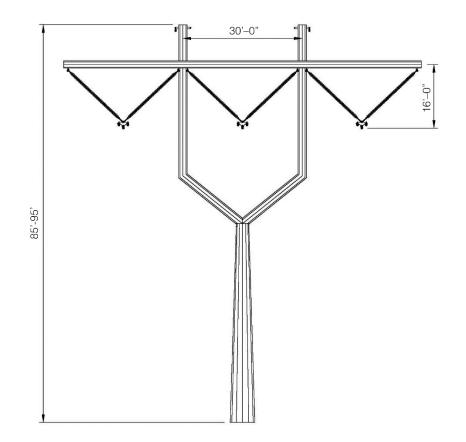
Alternative 500-kV Single-Circuit Tubular Steel Pole Y-Frame Structure
